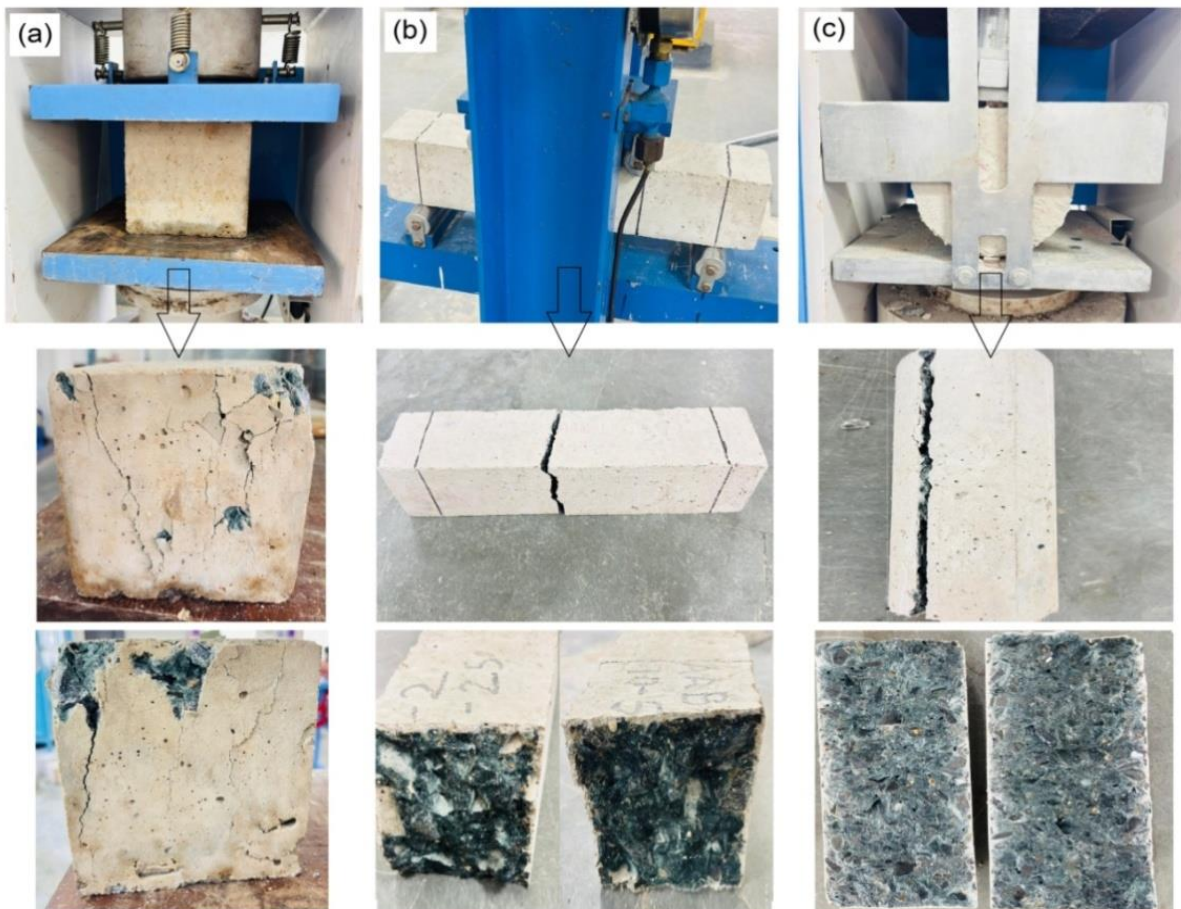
Test set-up and failure mechanisms of concrete specimens
